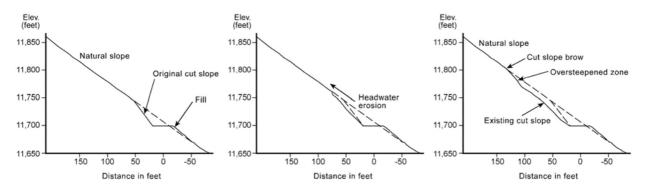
Schematic of raveling failure at cut slope in Type 3 and 4 rock.
